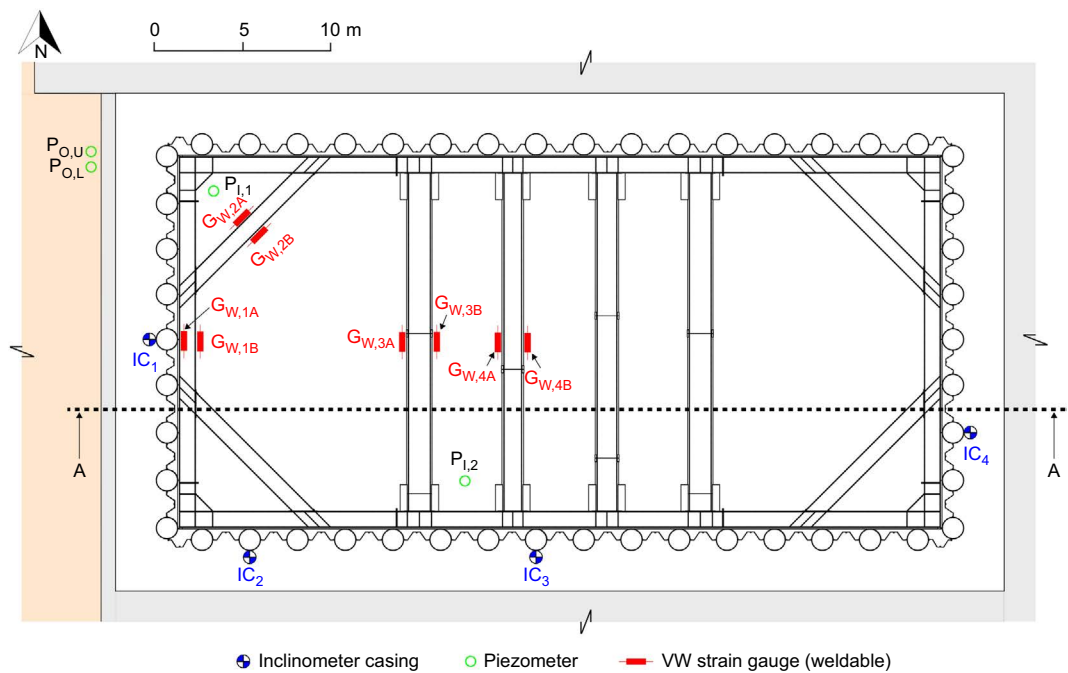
Plan layout of instrumentation used during excavation, taken through level 2 bracing
